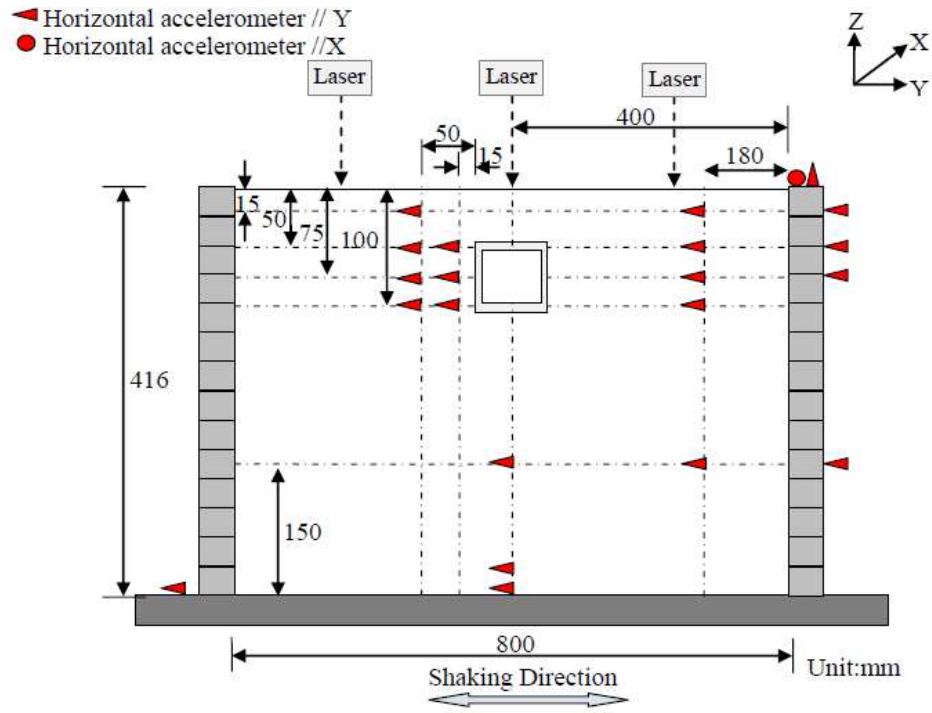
Elevation view of instrumentation layout of centrifuge tests on model culverts (Ozkan et al. 2013).
